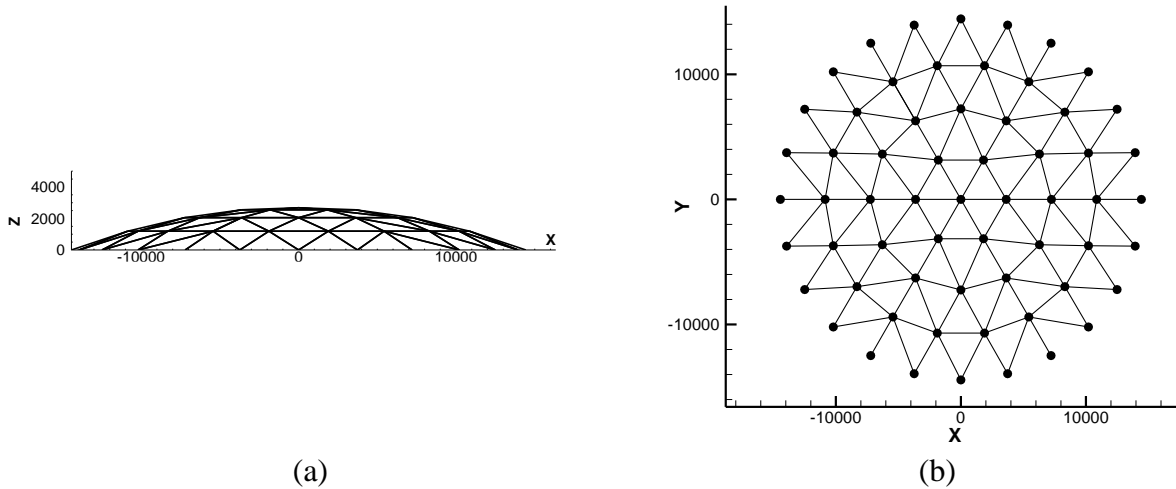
a) Plan, b) view of 133-member dome (all dimensions in mm)
